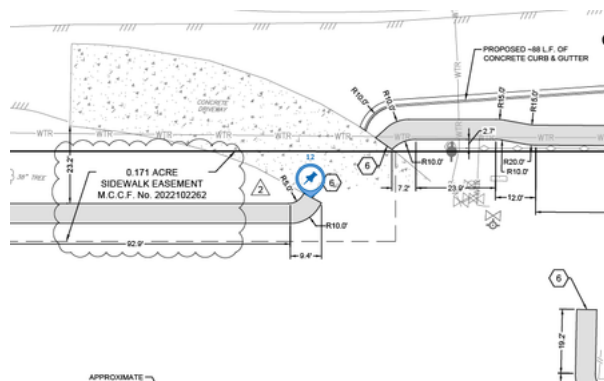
PAVING & DIMENSION PLAN Rev.0
